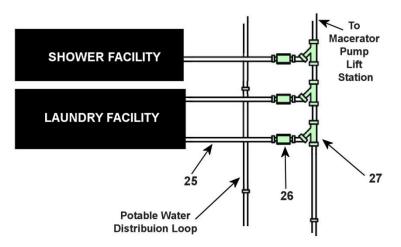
Shower and Laundry Wastewater Hose Component Layout.
